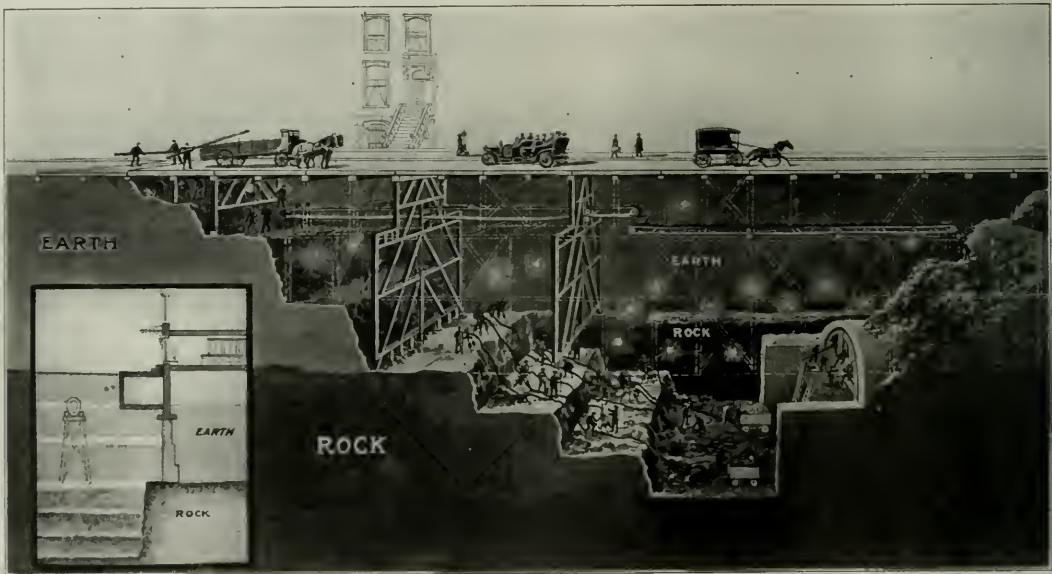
Proposed Method of Excavating Pennsylvania Crosstown Tunnels West of Fifth Avenue.
